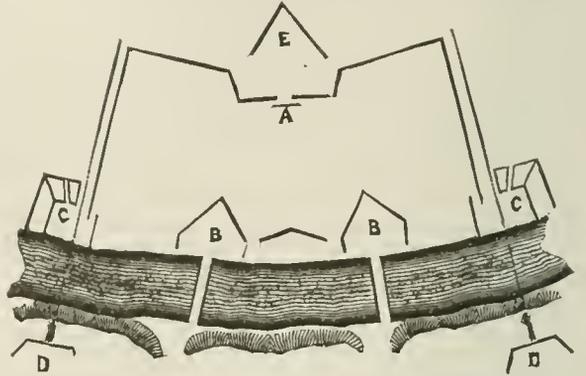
Plan of a Horn-work Tête-de-pont. A, Traverse to cover outlet in the curtain; B B, Stockade head of bridge; C, Outlets on the Flanks; E, Redan covering Outlet at A; D, Batteries.
